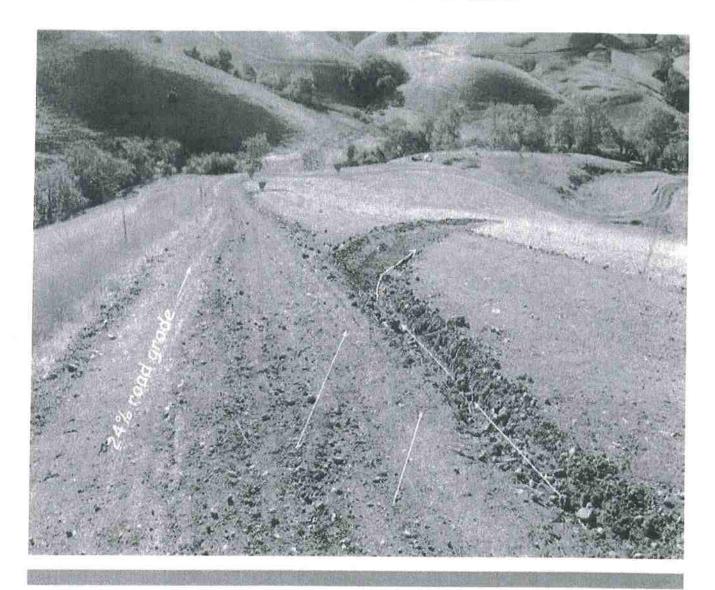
Steep roads that go straight up or down a hillside are very difficult to drain. This steep, fall line road developed a through cut cross section that was drained using lead out ditches to direct runoff off the road and onto the adjacent, vegetated hillside. The road was "outsloped" to drain runoff to the right side, and the lead out ditch was built slightly steeper than the road grade, to be self-cleaning. Four lead out ditches have been constructed at 100-foot intervals to the bottom of the hillside.
